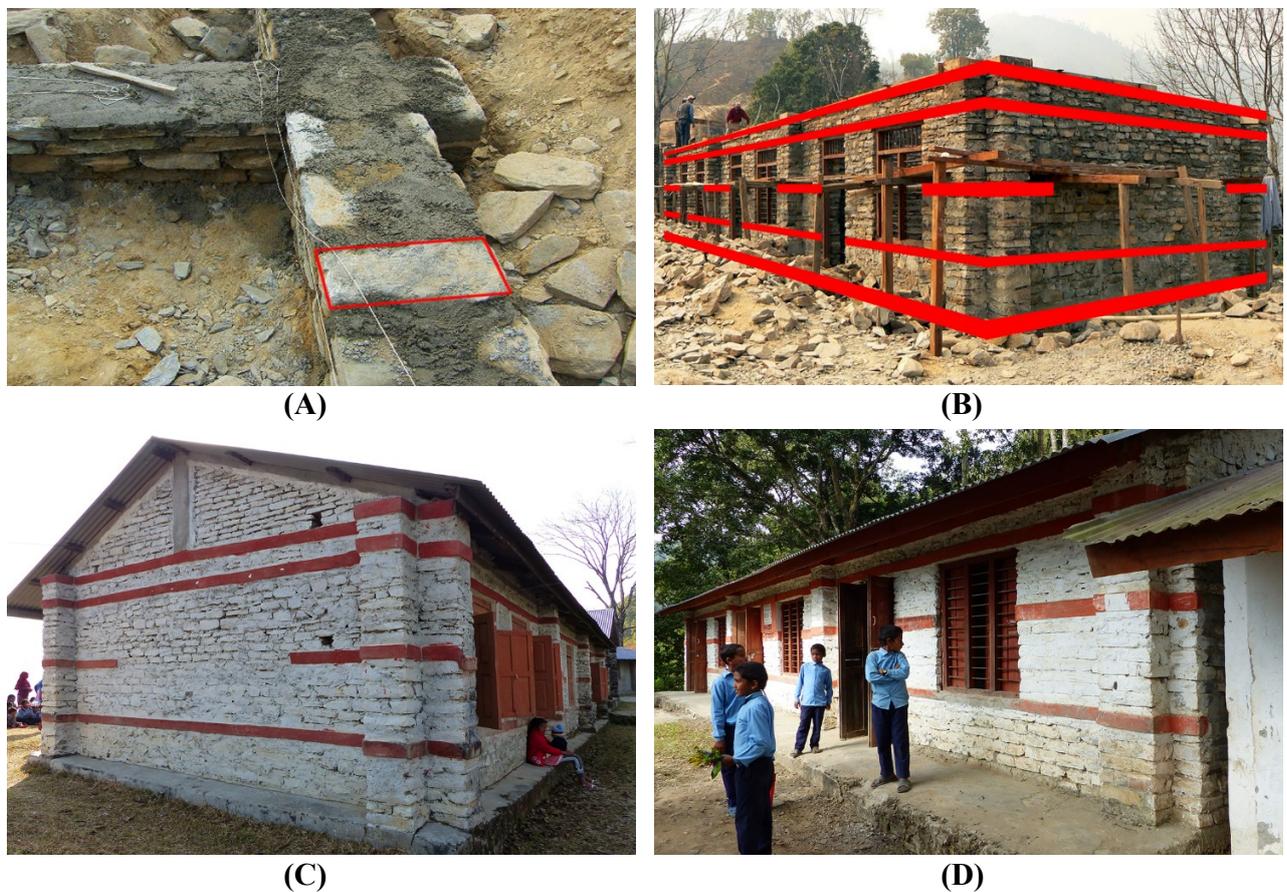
Details of schools as constructed by SSF in Nepal including (A) walls with cement mortar, through stones but without vertical reinforcements, and (B) horizontal bands at five levels. Pictures of the undamaged state of the schools in (C) Mugri and (D) Makaikhola, after the 2015 Gorkha Earthquakes (courtesy of SSF).
